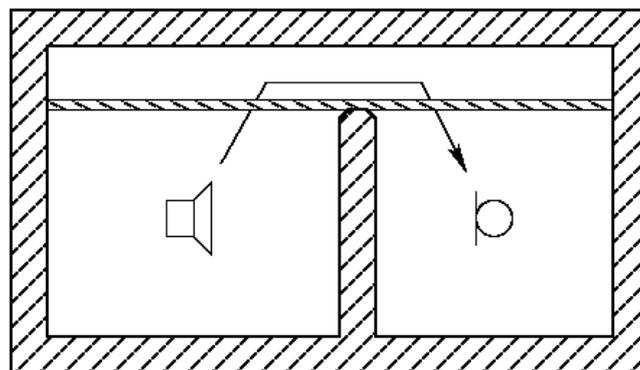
Layout of a test facility with a flanking test object installed alongside the test facility wall (top view).
